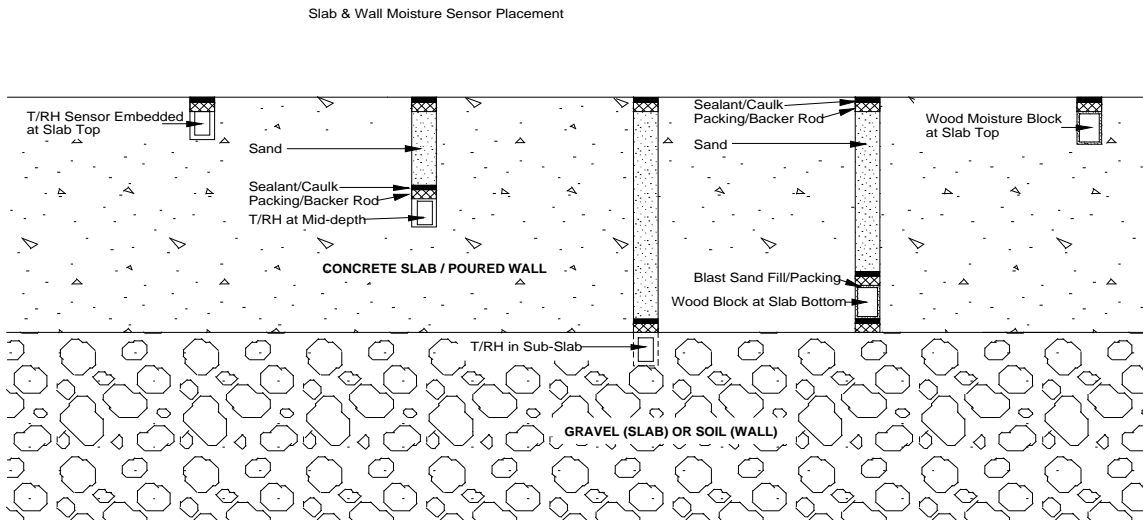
Sectional view of typical sensor placement in poured wall and slab floor clusters. Placement in block walls is similar, but modified for open cores and web.
